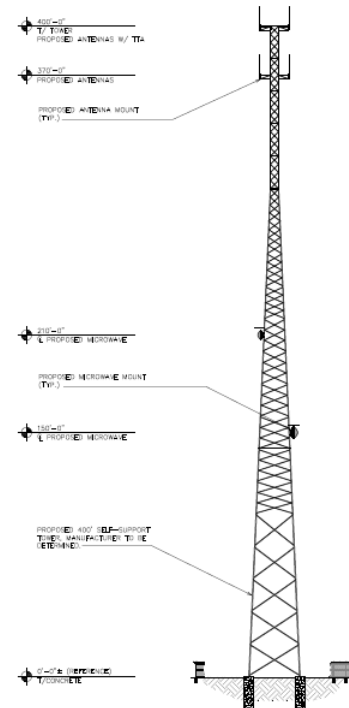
Elevation view of proposed 400-ft public safety radio tower
